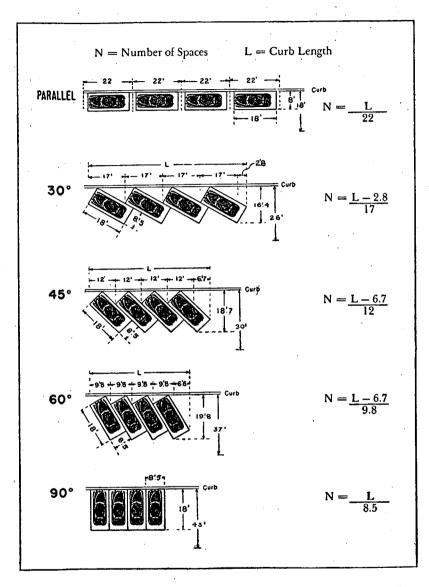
Street space used for various parking positions, using stalls 8 feet, 6 inches wide.
